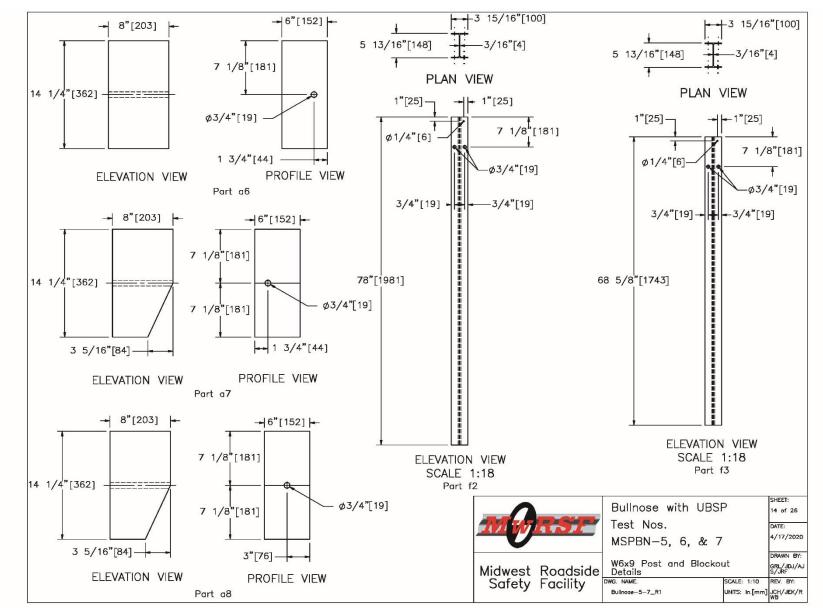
W6x9 Post and Blockout Details, Test Nos. MSPBN-5 through MSPBN-7
